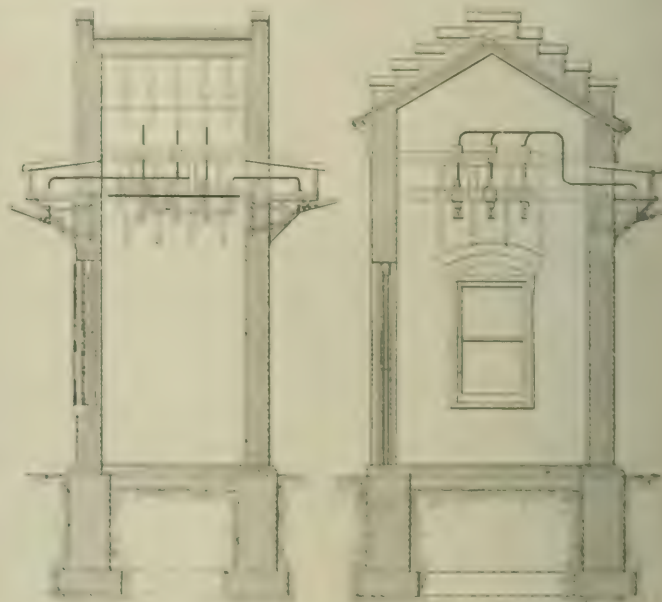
SECTIONAL ELEVATIONS. TRANSFER SWITCH HOUSE
